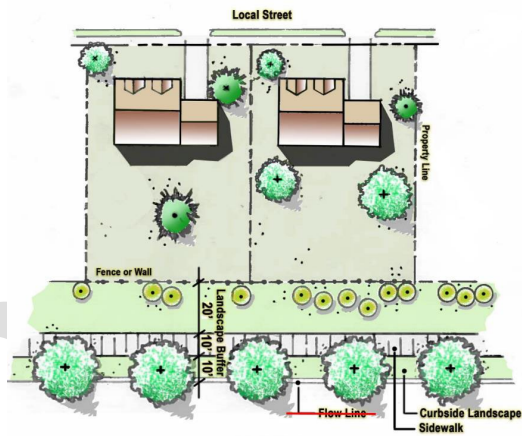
Arterial Street (Painted Median) Frontage Buffer Measurement Detached Straight Walk
